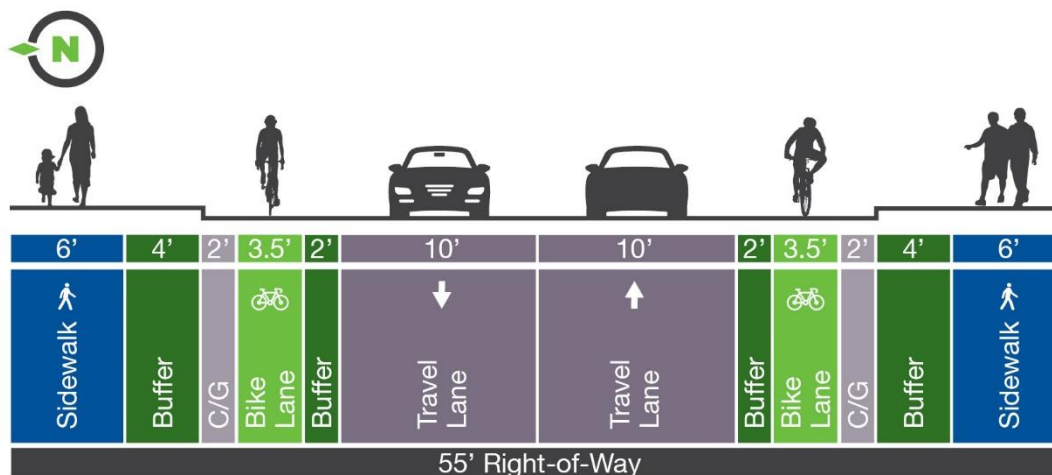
9th Street Cross-Section (Center Street to Lake Street) (Option 1)
